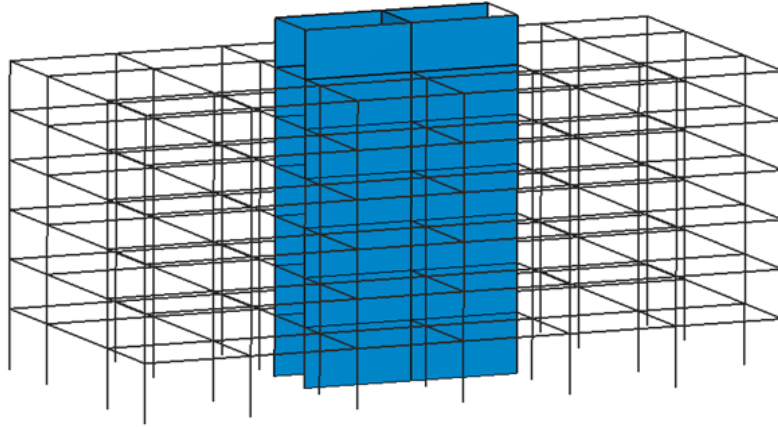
Six floor model with steel framework, floor slabs and elevator shaft
